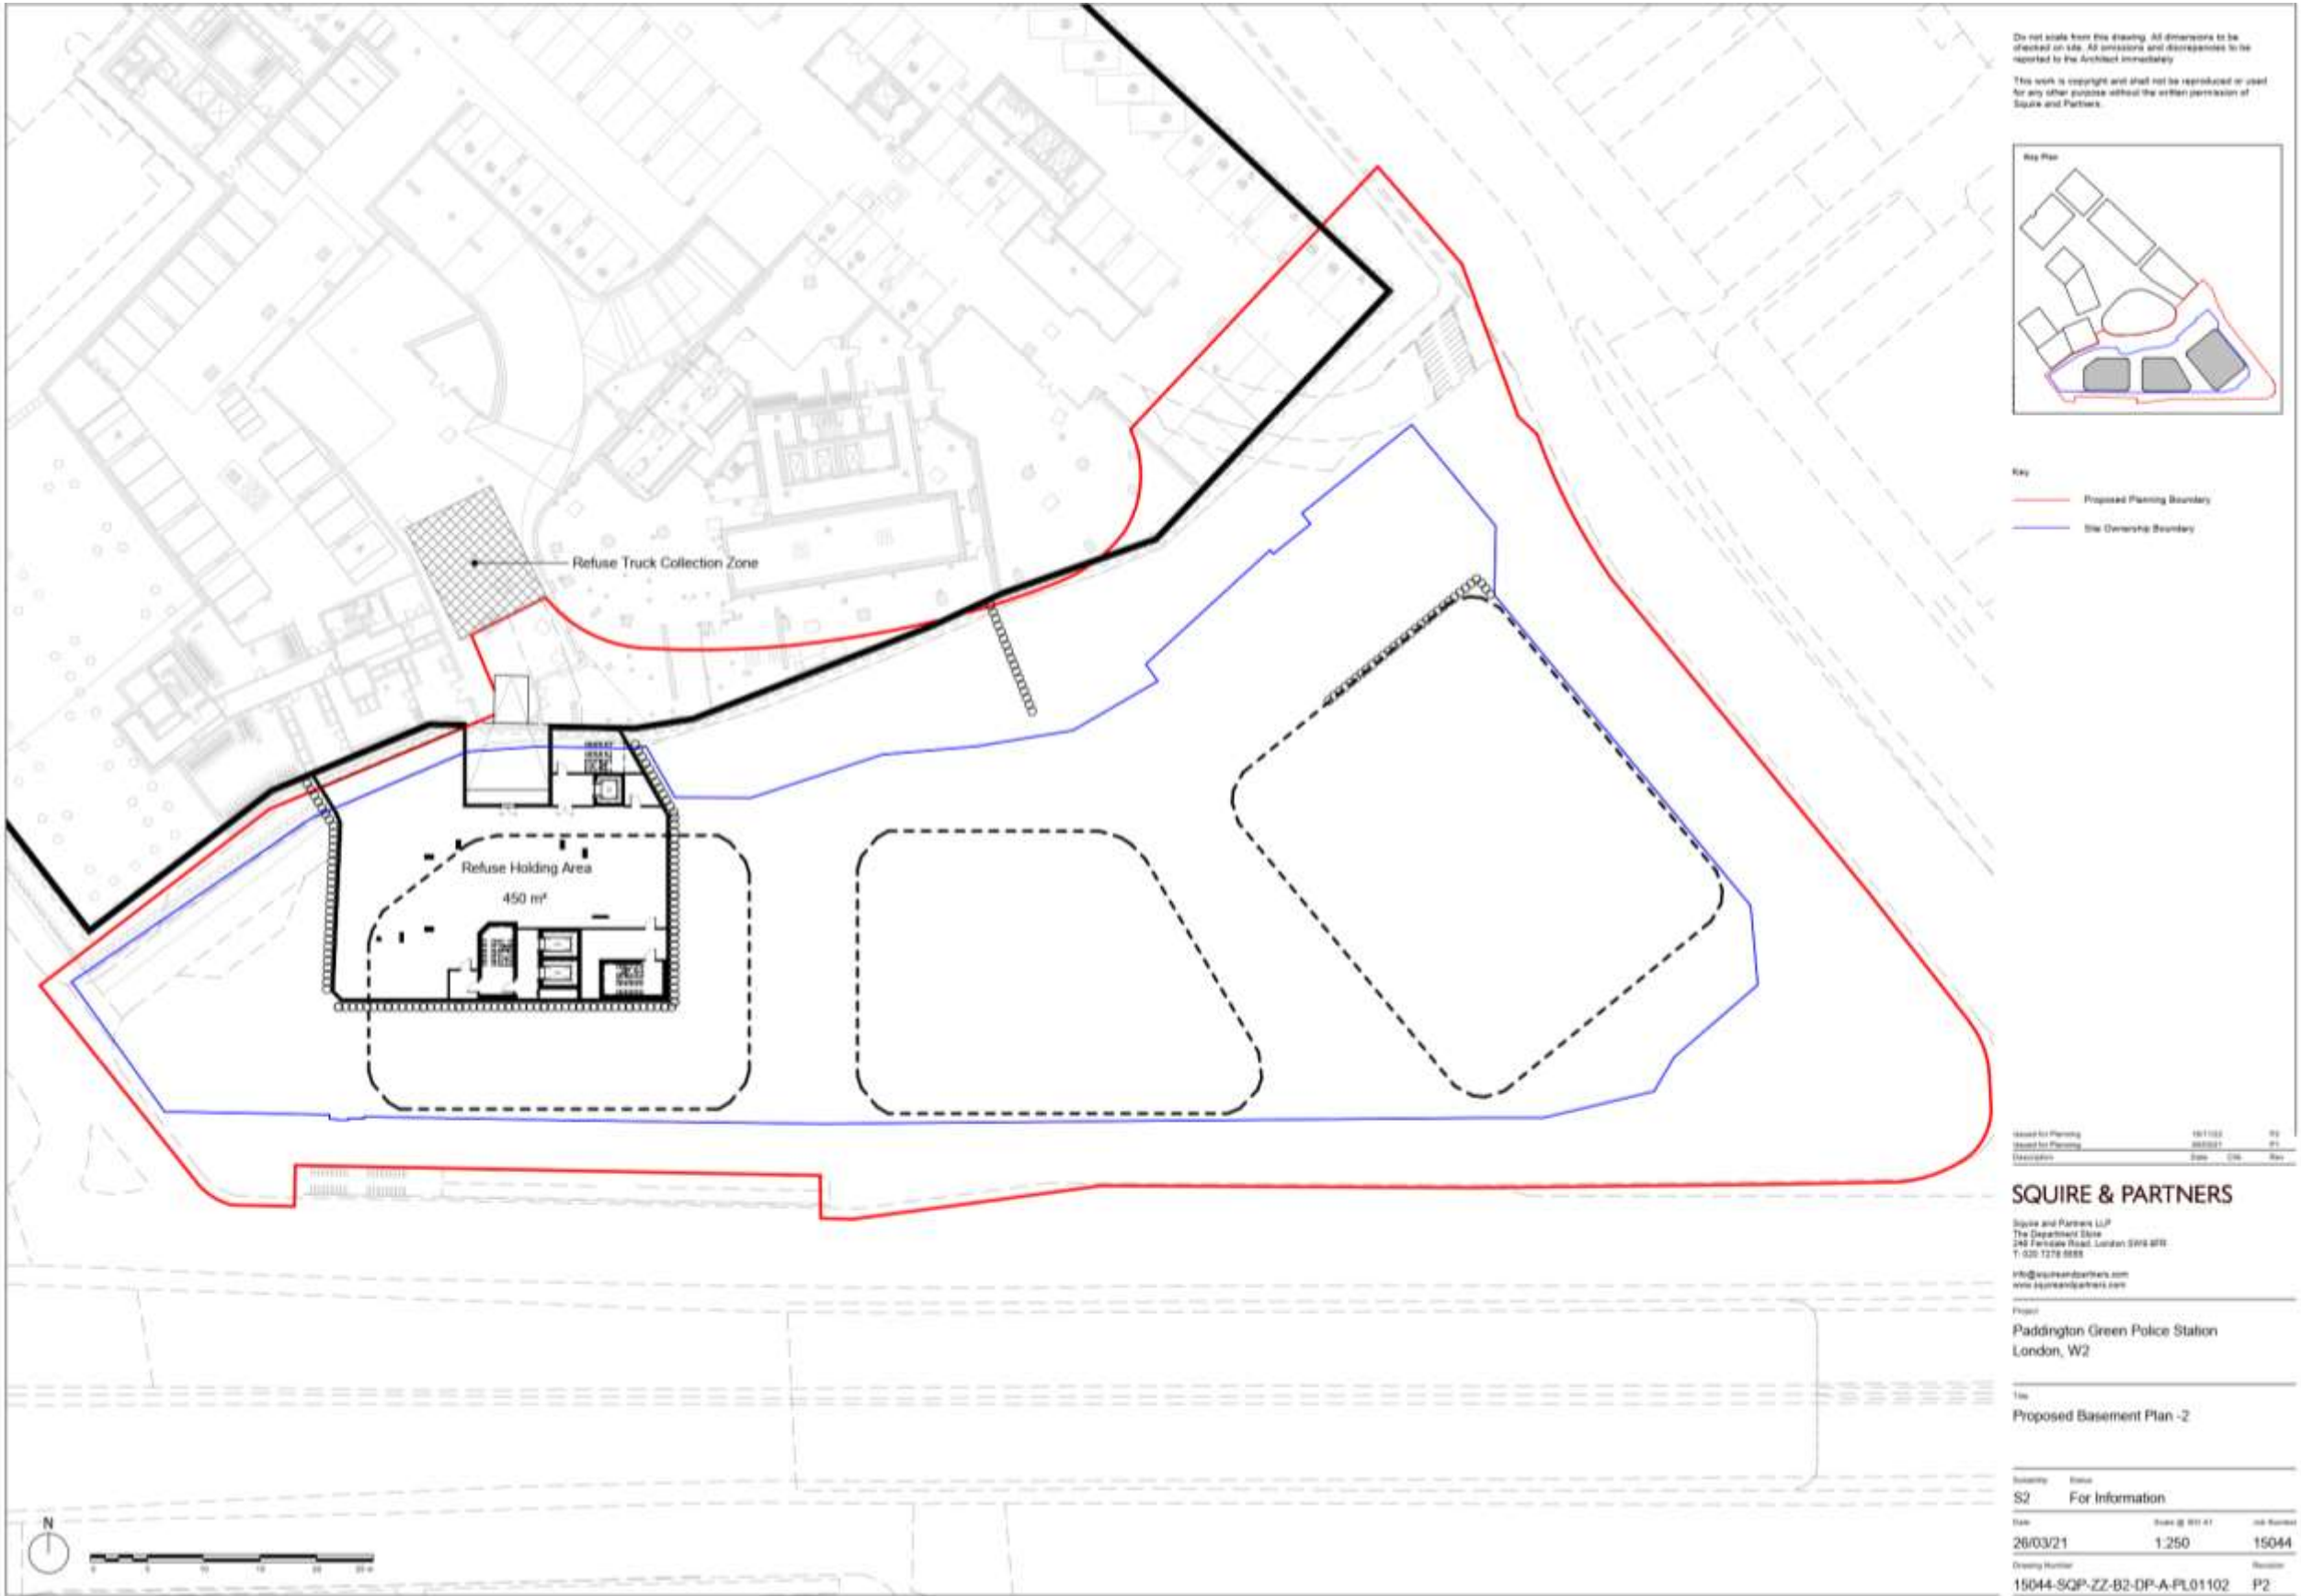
2022 Amended Proposed Development Basement Level B2 General Arrangement Plan
